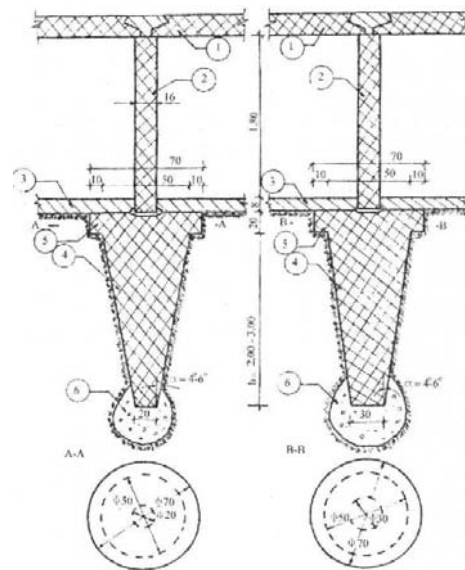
Tronconic dorm elements infrastructures with antipressing plate achievable by vibra-percussions. 1 - prefab floor; 2 - prefab elevation; 3 - basement plate; 4 - ET4 (ET5) dorm element; 5 - antipressure plate; 6 - bulb.
